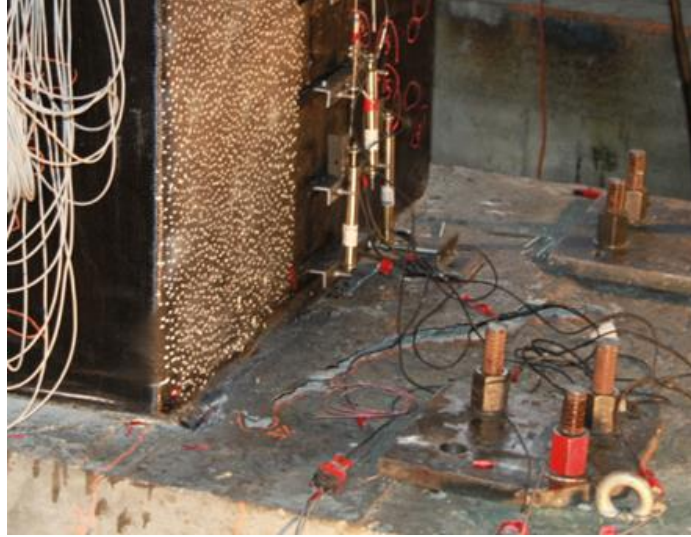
East side footing crack at 4% drift ratio for specimen R1
